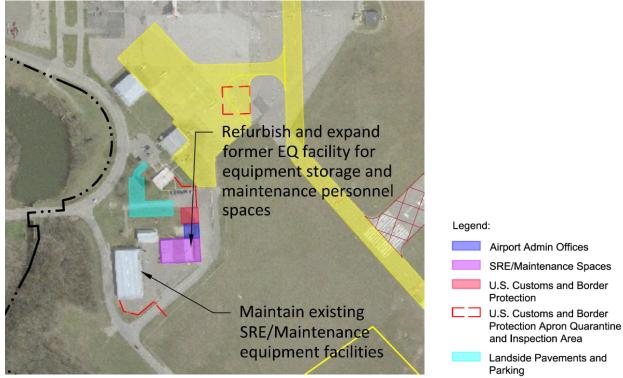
Alternative 16: Demolish Hangar 1 & Expand Former EQ Building
